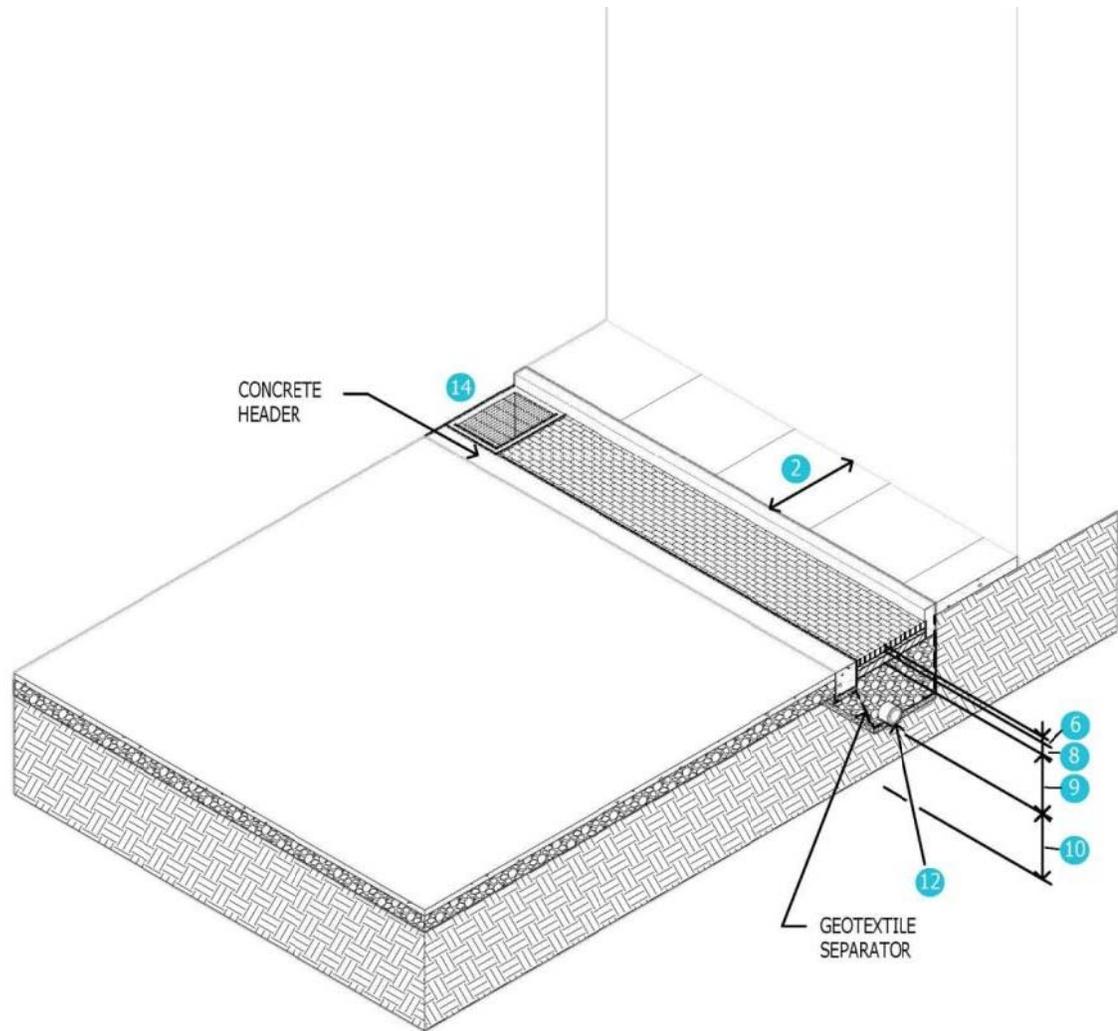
PERMEABLE PAVEMENT DIAGRAM
